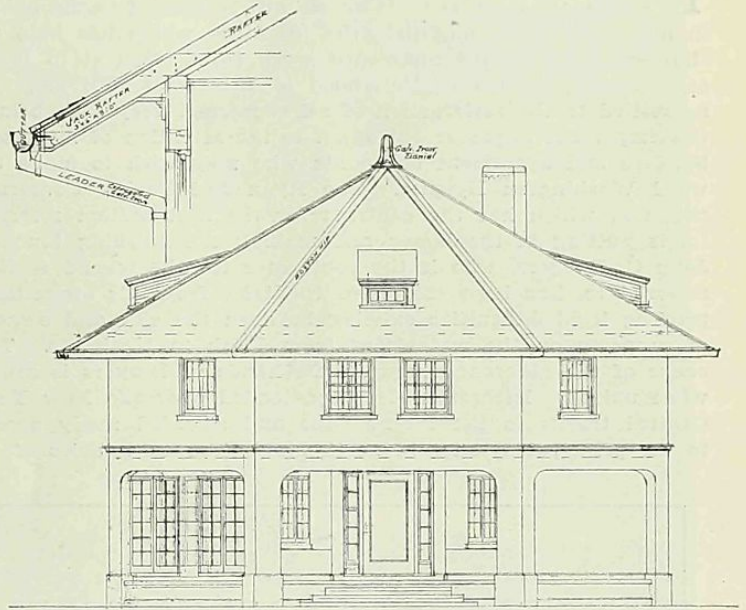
FRONT ELEVATION OF HOUSE FOR MR. FRANK VERNON.
